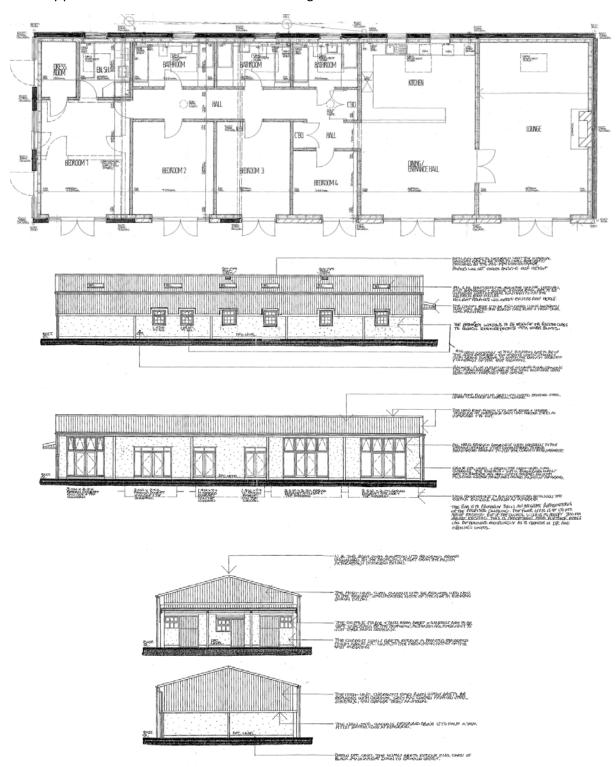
Historic floor plan and elevations as submitted with reference: 18/0174/PAC
